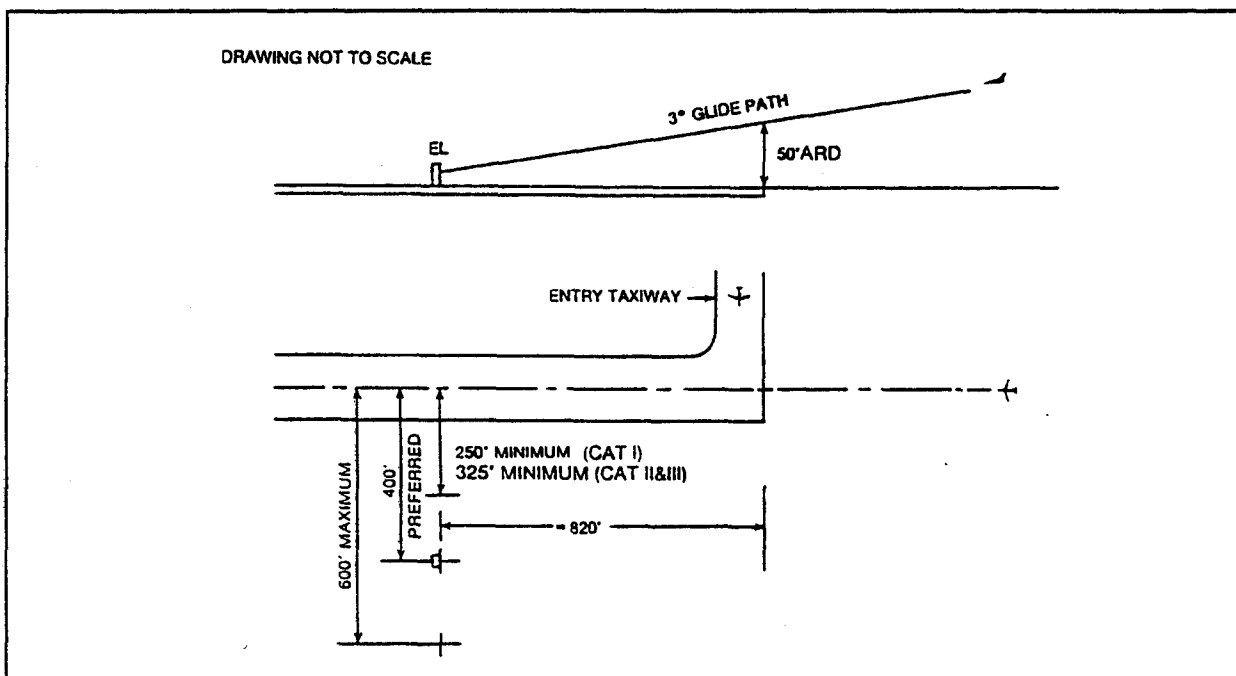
PREFERRED AND ALTERNATE LOCATIONS FOR ELEVATION STATION.
